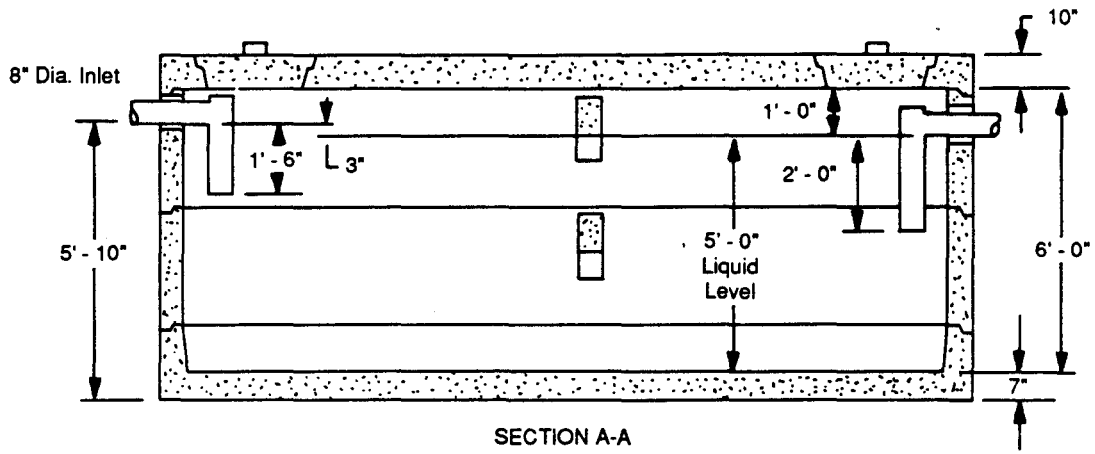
CHESTER PARK STRUCTURAL DETAILS
